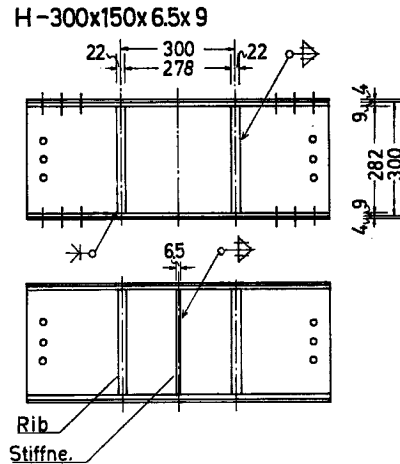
Test Specimen of Steel Panel (unit: mm)
